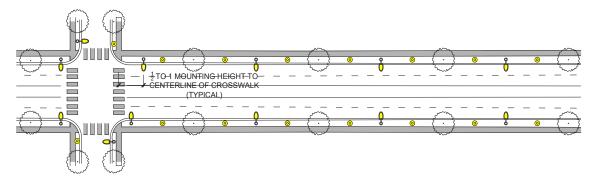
Typical Collector Street with Continuous Street and Pedestrian Lighting
